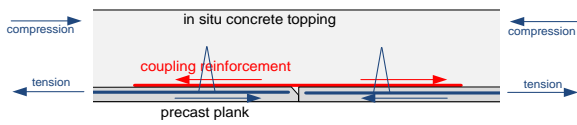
Critical detail at the location of two precast plates with lattice girders.
